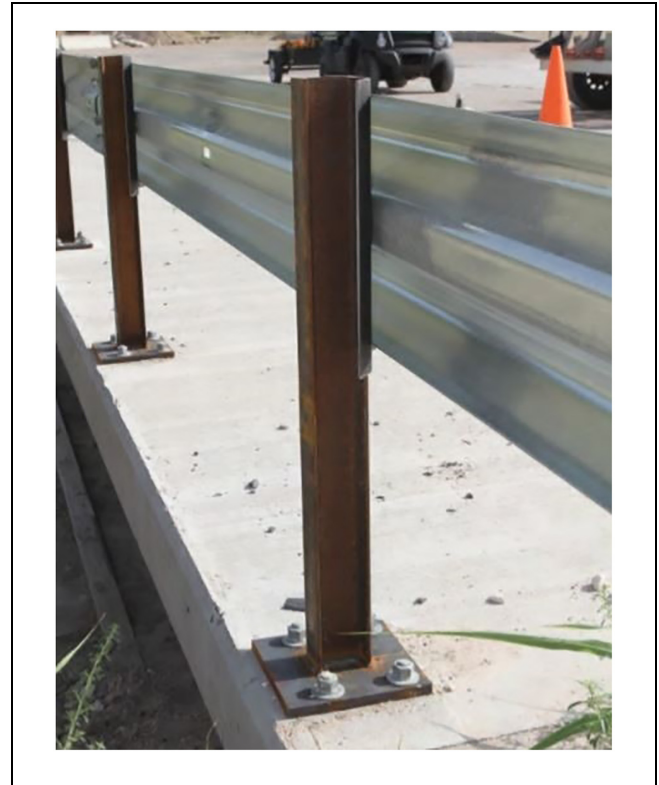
Midwest Guardrail System bridge rail test installation.
